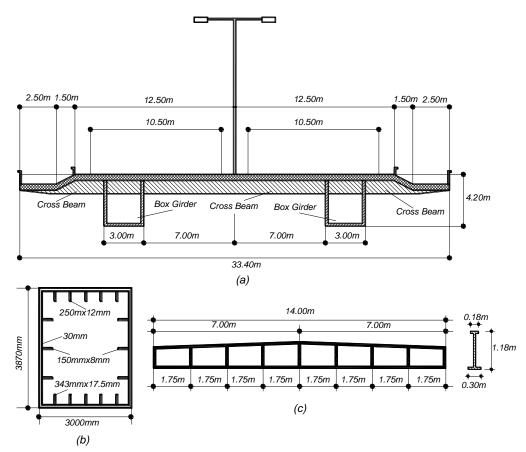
General layout of (a) the deck section, (b) the box-girders and (c) the cross-beam
